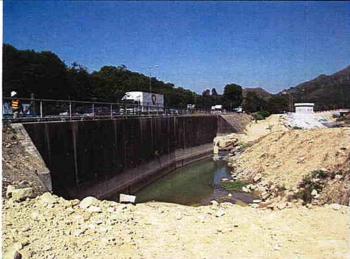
h November 2007, viewed towards Fanling Highway near Kiu Tau from illustrating construction works in Ma Wat River Natural Woodland
